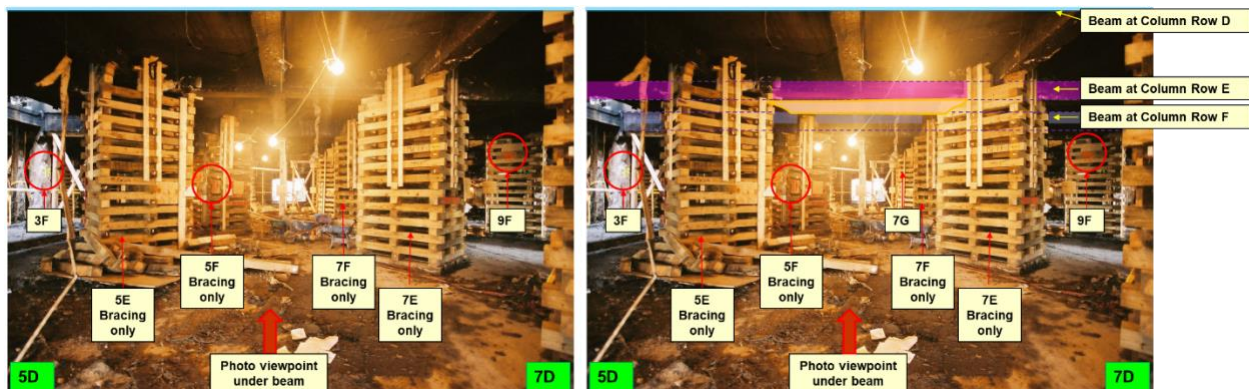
View of the area under the uplifted slab during clean-up³. Right side highlights beams and ceiling area from column rows E to F.
